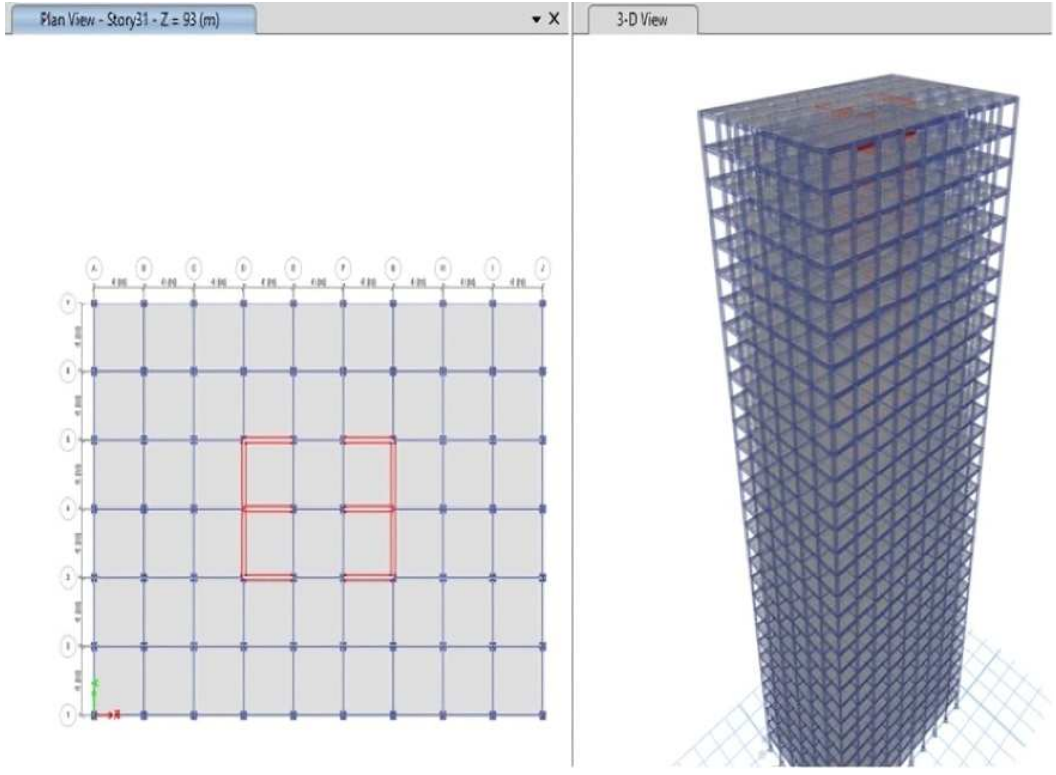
Simulation 8 - Structure incorporating a centrally positioned shear wall in an E-shaped configuration
